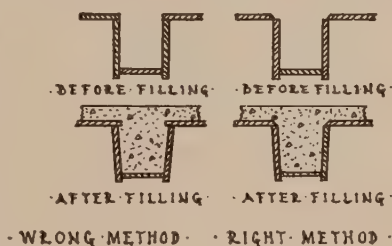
Right and wrong ways of framing beam and floor-panel forms.
